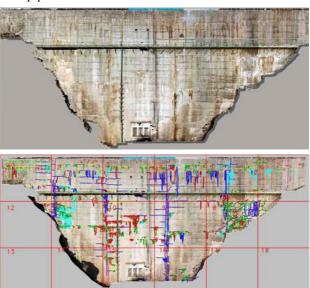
Pathology monitoring of concrete wall dam (Alto Ceira dam, Portugal) top: Orthophoto; bottom: vectorized CAD features drawn over orthophoto.
